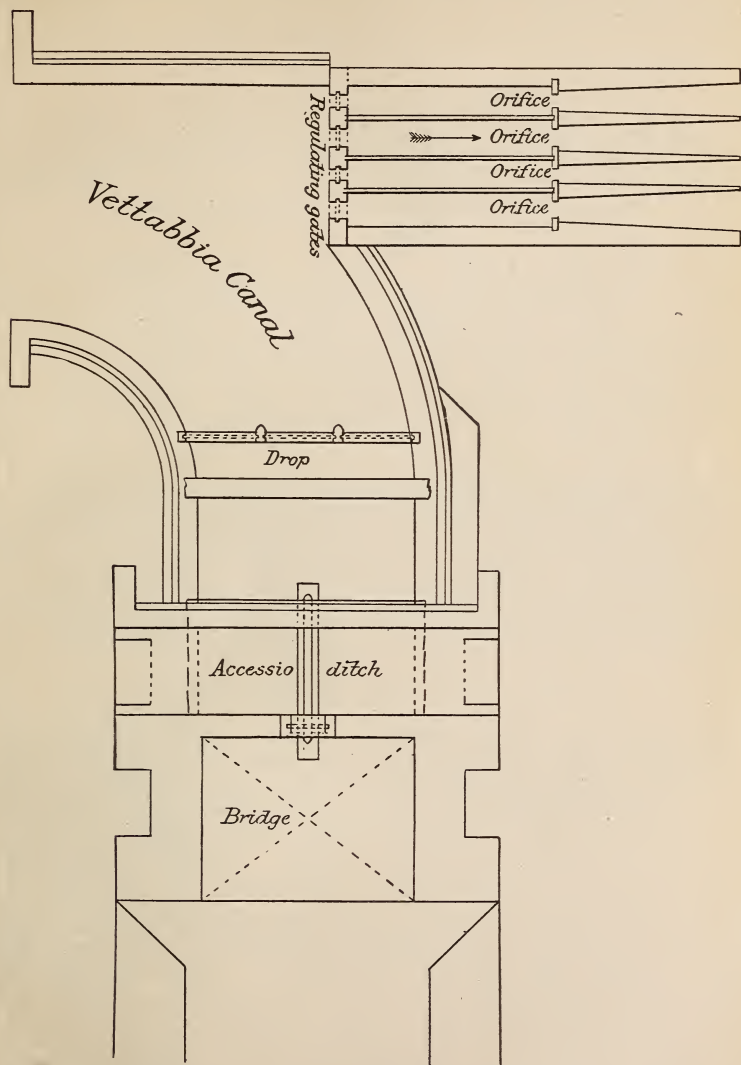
Section showing measuring boxes, drop, flume, and bridge crossing on branch of Vettabbia Canal.
